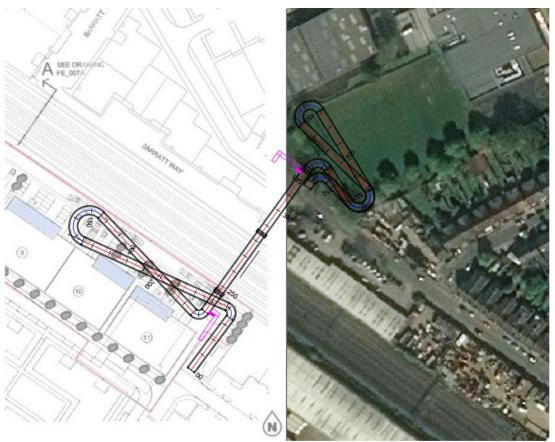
Proposed Structural Plan A – Walkway/Cycleway
